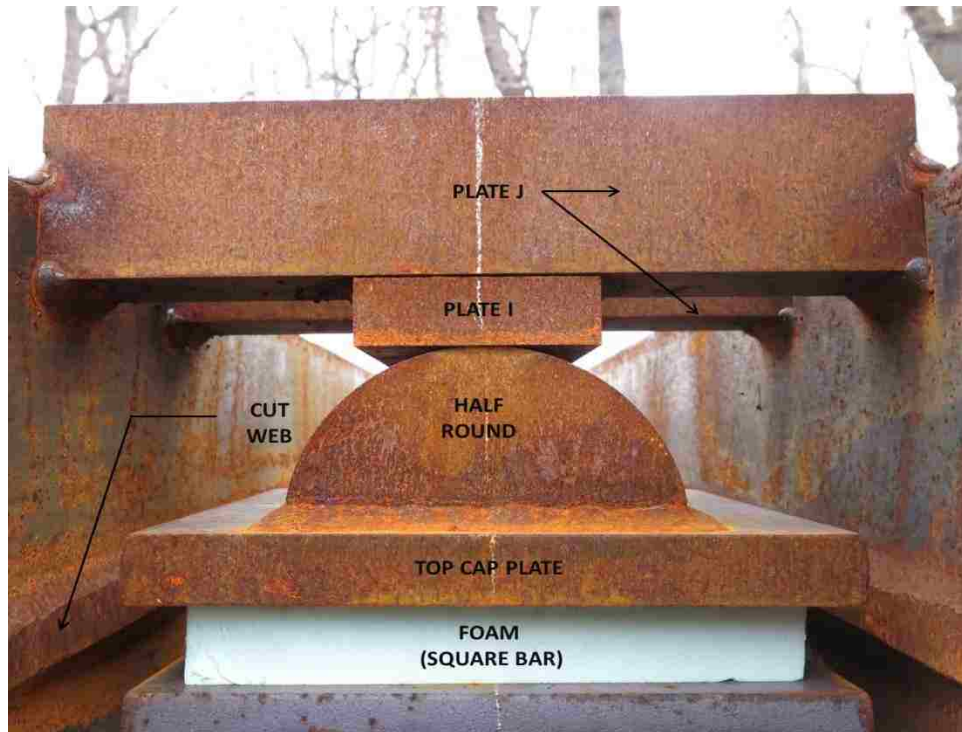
Photograph of load bearing assembly at Section Type C and Section Type D looking in parallel direction
